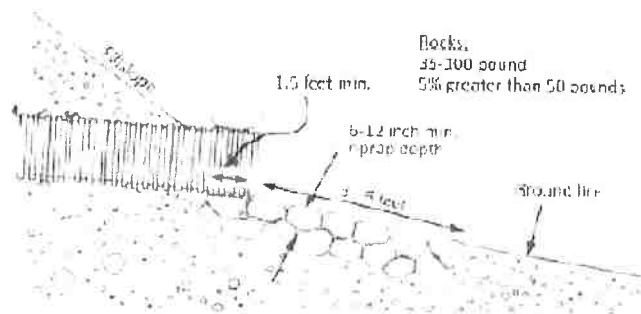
A. Riprap armor at culvert outlet (Modified from Keller et al. 2011).
